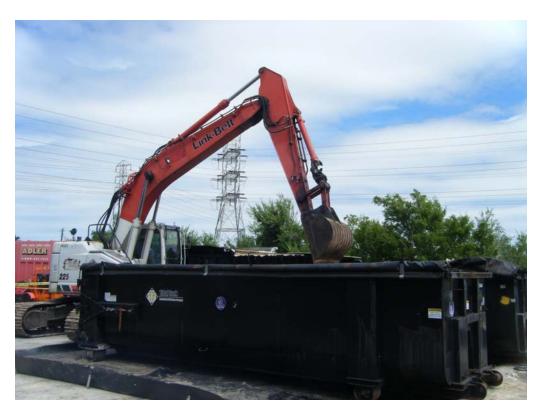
Sumter track-mounted excavator in northern portion of USOR parking lot
